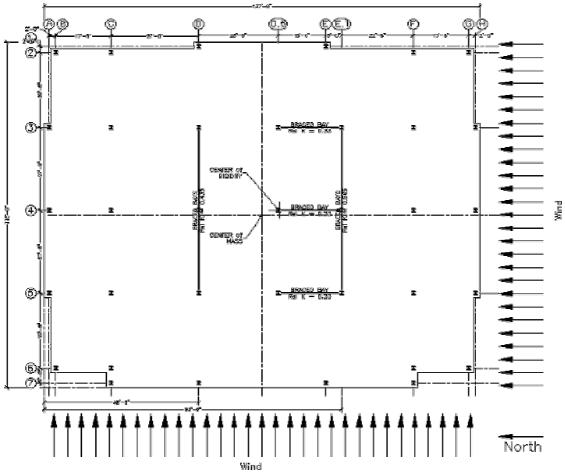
Wind direction, Frame locations, and Centers of rigidity, pressure, mass
